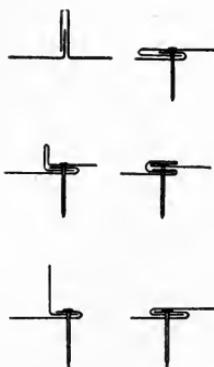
PLATE VIII. DETAILS OF TIN-CLAD FIRE DOOR
